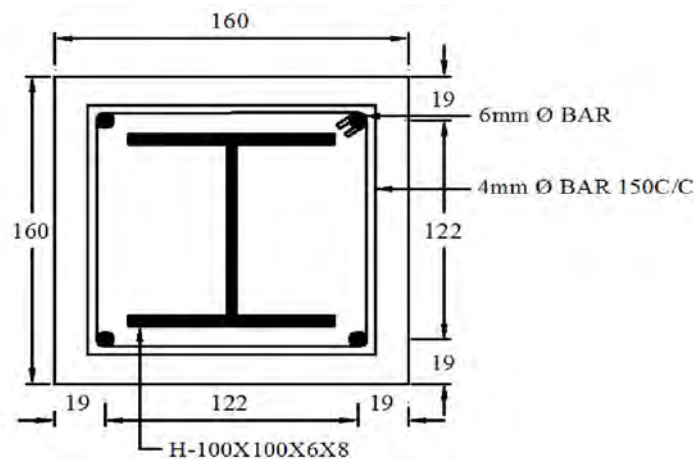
Typical cross section of FEC columns (Morino et al. 1984)
